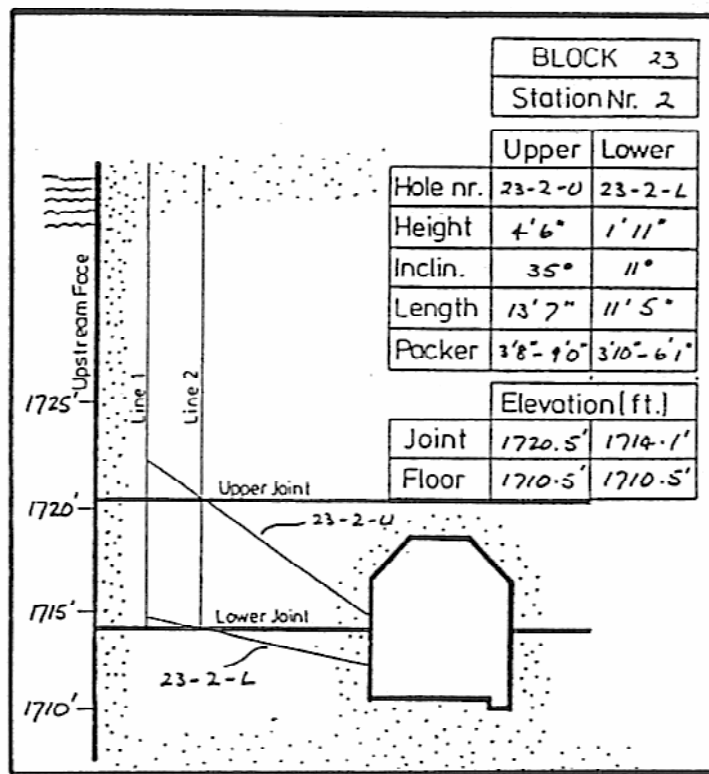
Typical section showing intended joint interceptions at one station, Santeetlah Dam (35).
